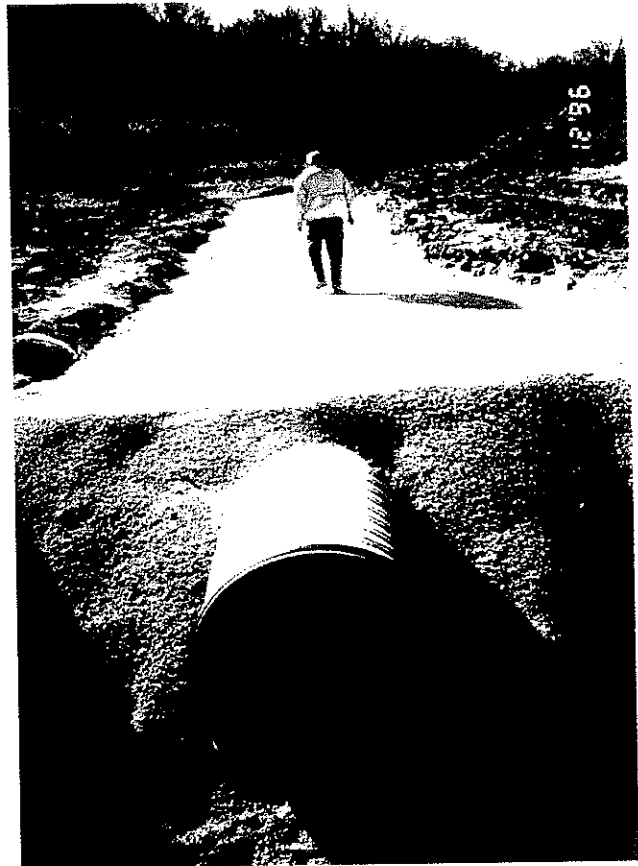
No. 8 stone backfilled to 1-foot above the crown of the culvert.
